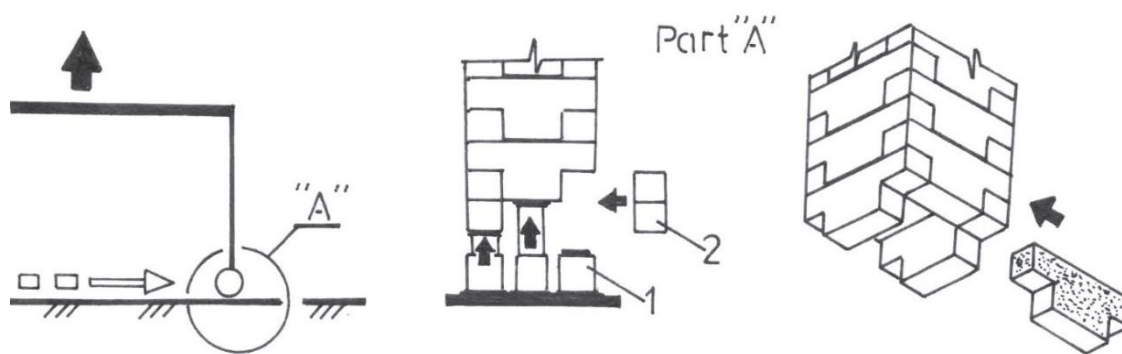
The process of lifting the roof with the relying on the growing project columns: "A" – growing unit, 1 – hydraulic jack, 2 – T-type segment.
